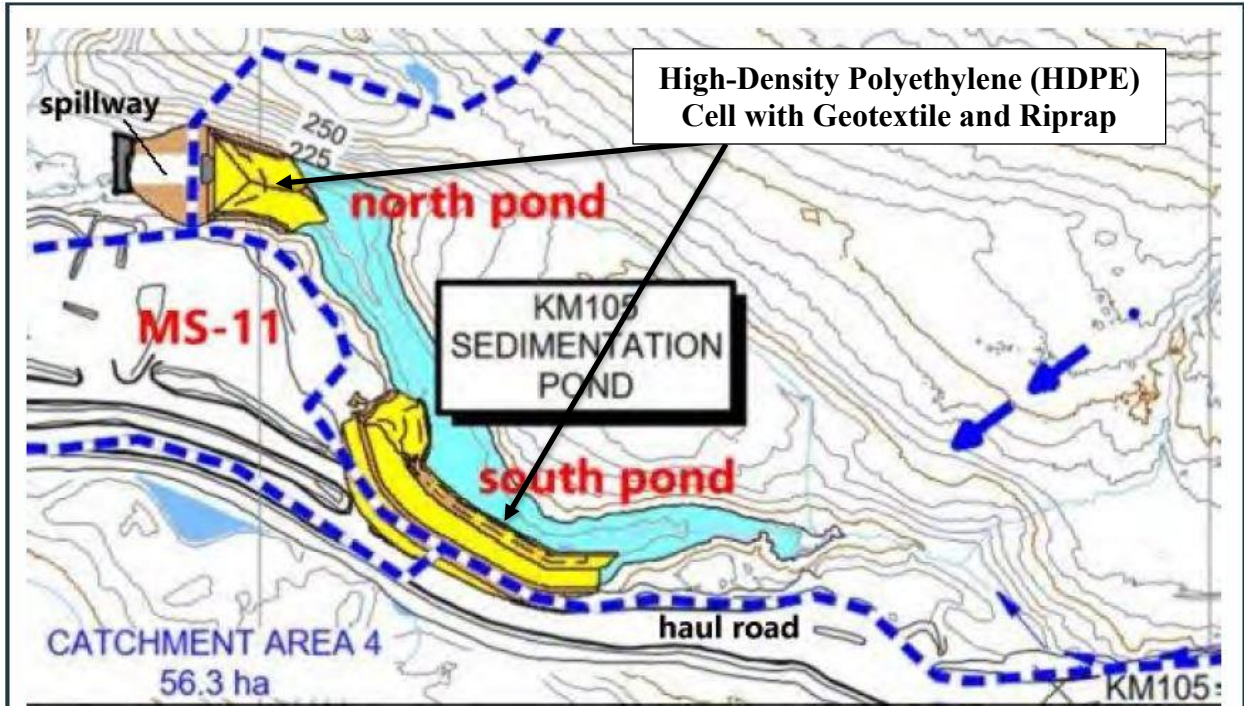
Km 105 Sedimentation Pond and Dam Design Drawings - Knight Piésold Ltd. 2021 (from Baffinland's Annual Geotechnical Inspection Report – 2024)
